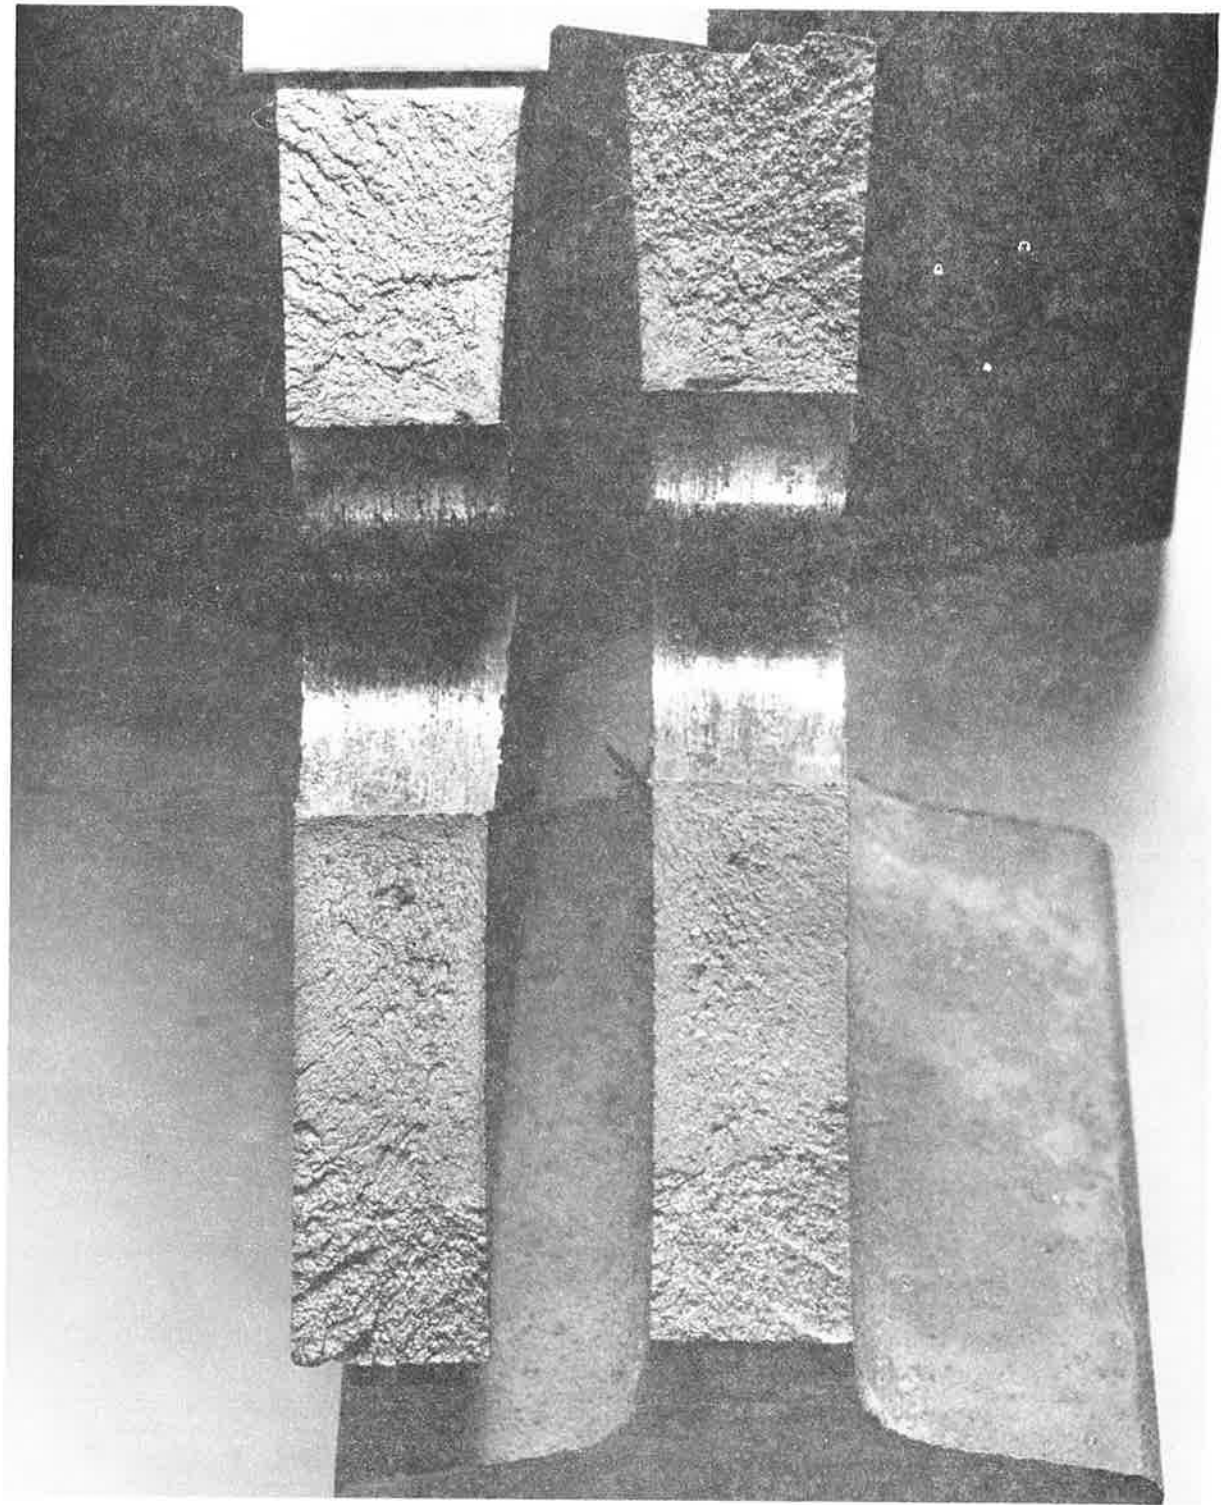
Specimen 6A-8: View of Fracture Surface. Point of Fatigue Initiation Indicated by Arrows
